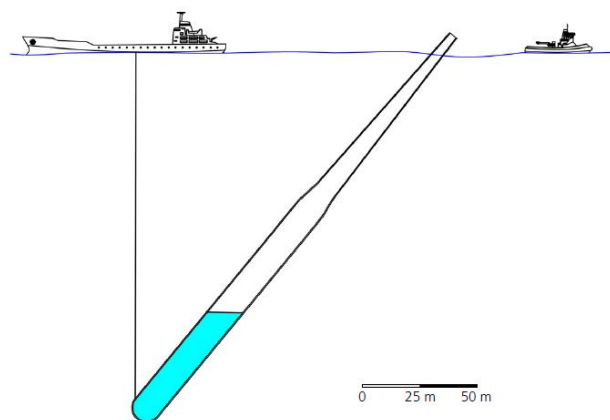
WindCrete erection process (See Ref.[OP5])
